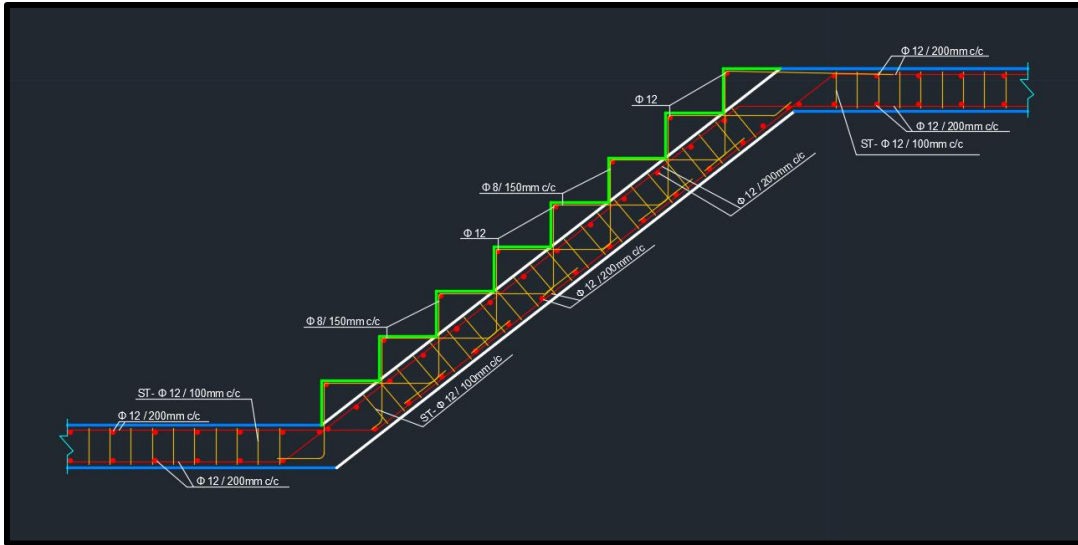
Staircase Longitudinal Section for Reinforcement
